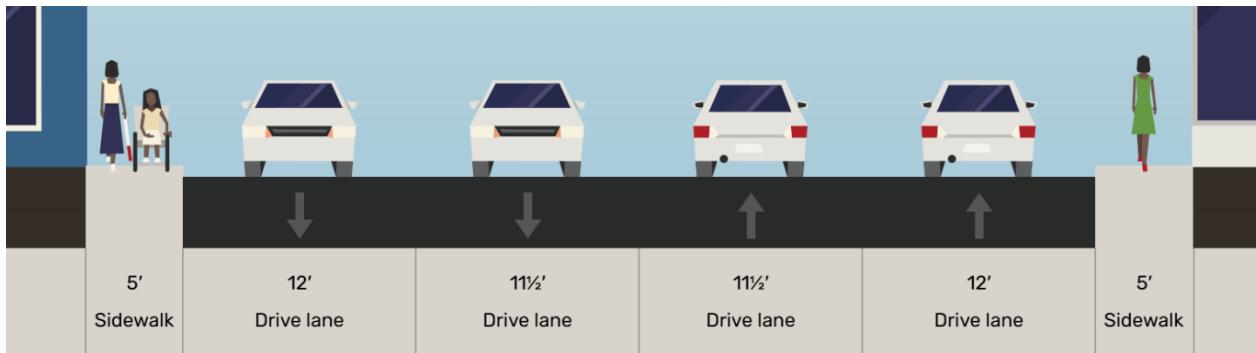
EXISTING TYPICAL SECTION (28TH ST TO 22ND ST)
